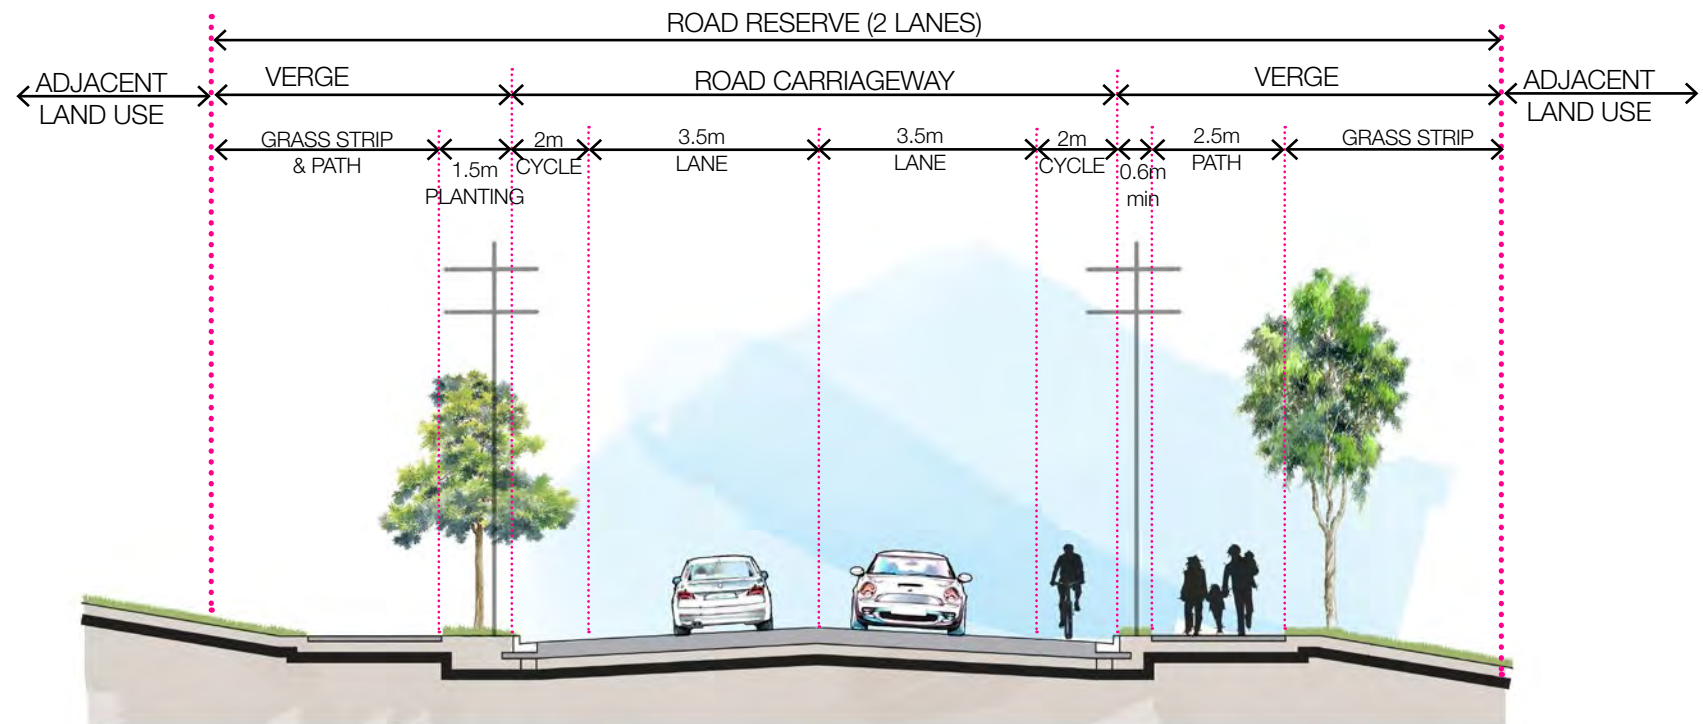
Arterial road cross section in urban setting, road corridor width varies between 20-30m
